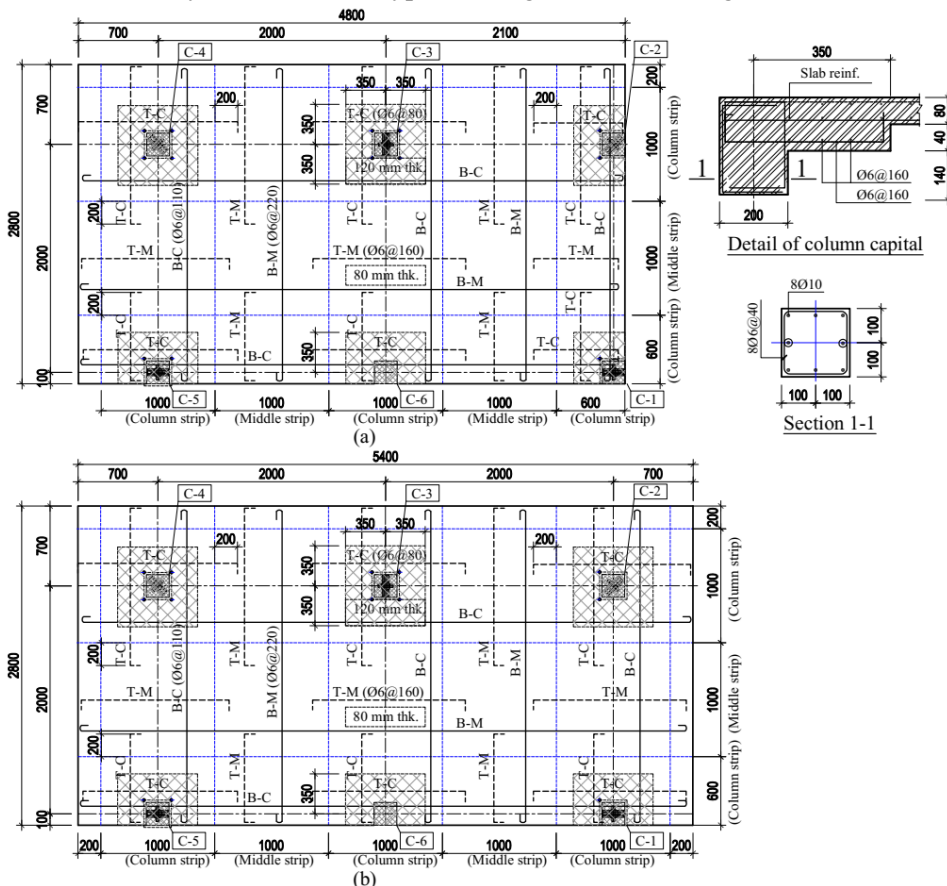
Detailed layout of test specimens: (a) Specimen MC; (b) Specimen PC
